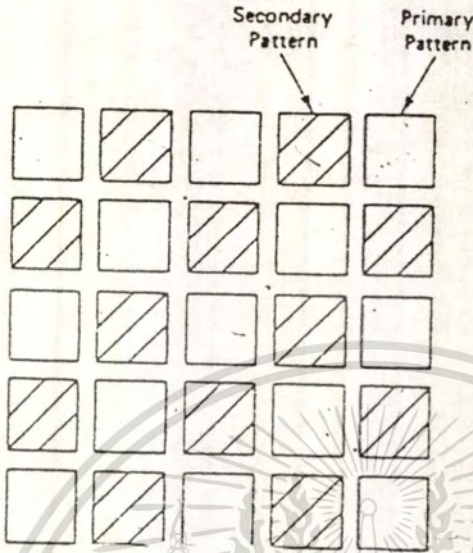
CONSTRUCTION SEQUENCE OF VIBRATED CONCRETE COLUMN
